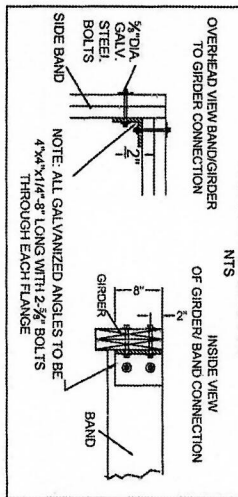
GALVANIZED STEEL STRAPS.
